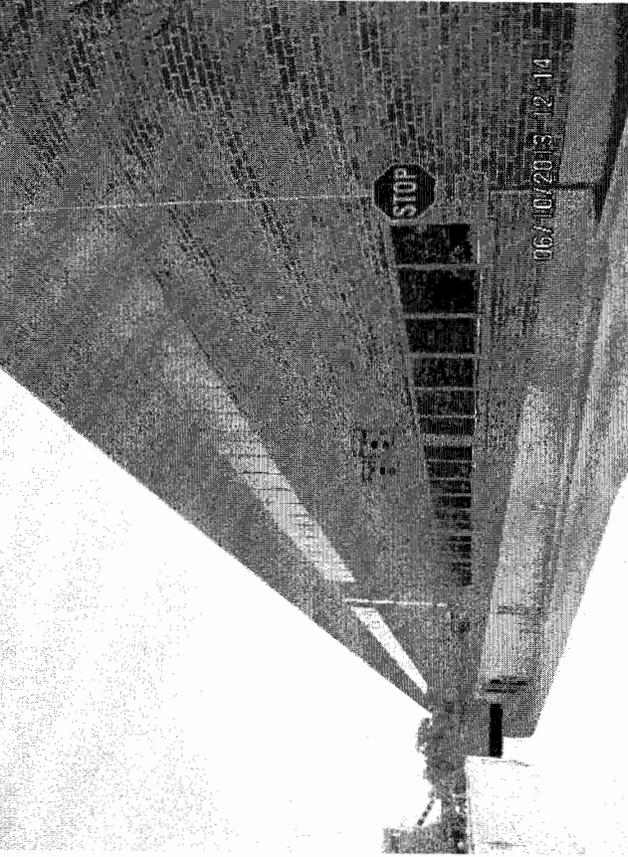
Second District Courthouse, Skokie-Typical above roof -clearstory windows
